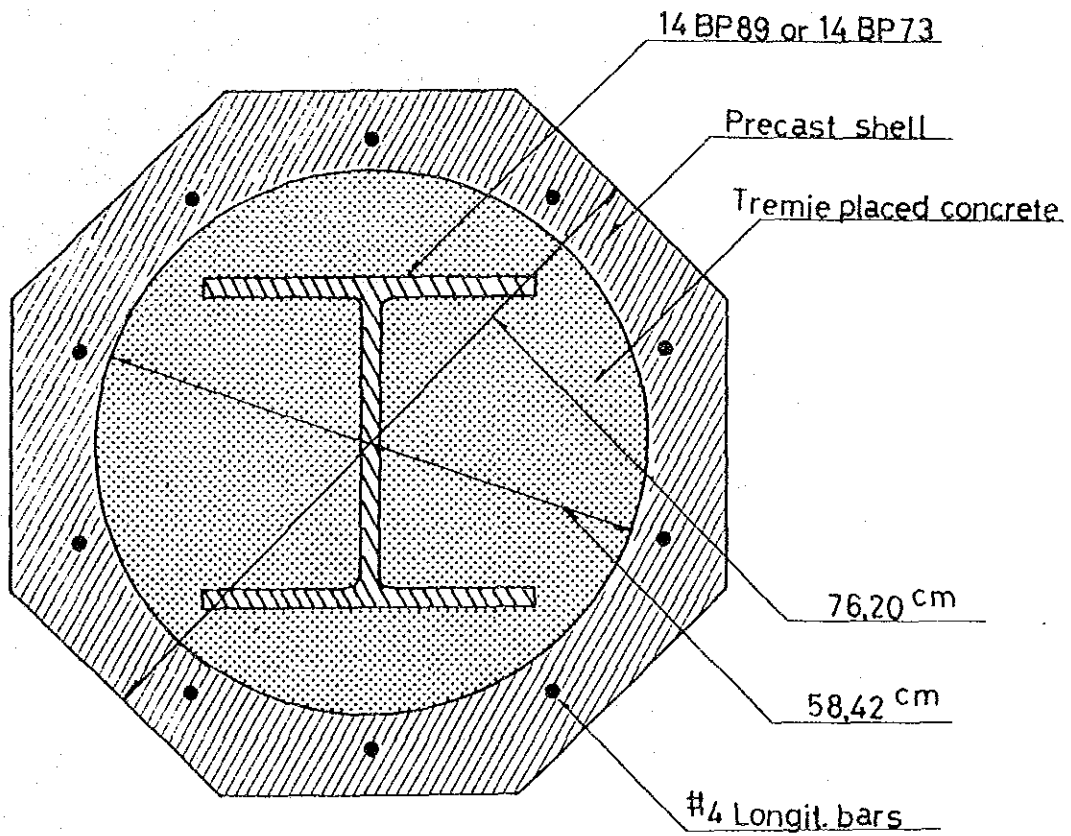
Typical Cross Section of the 14BP73 (or 14BP89) Piles
